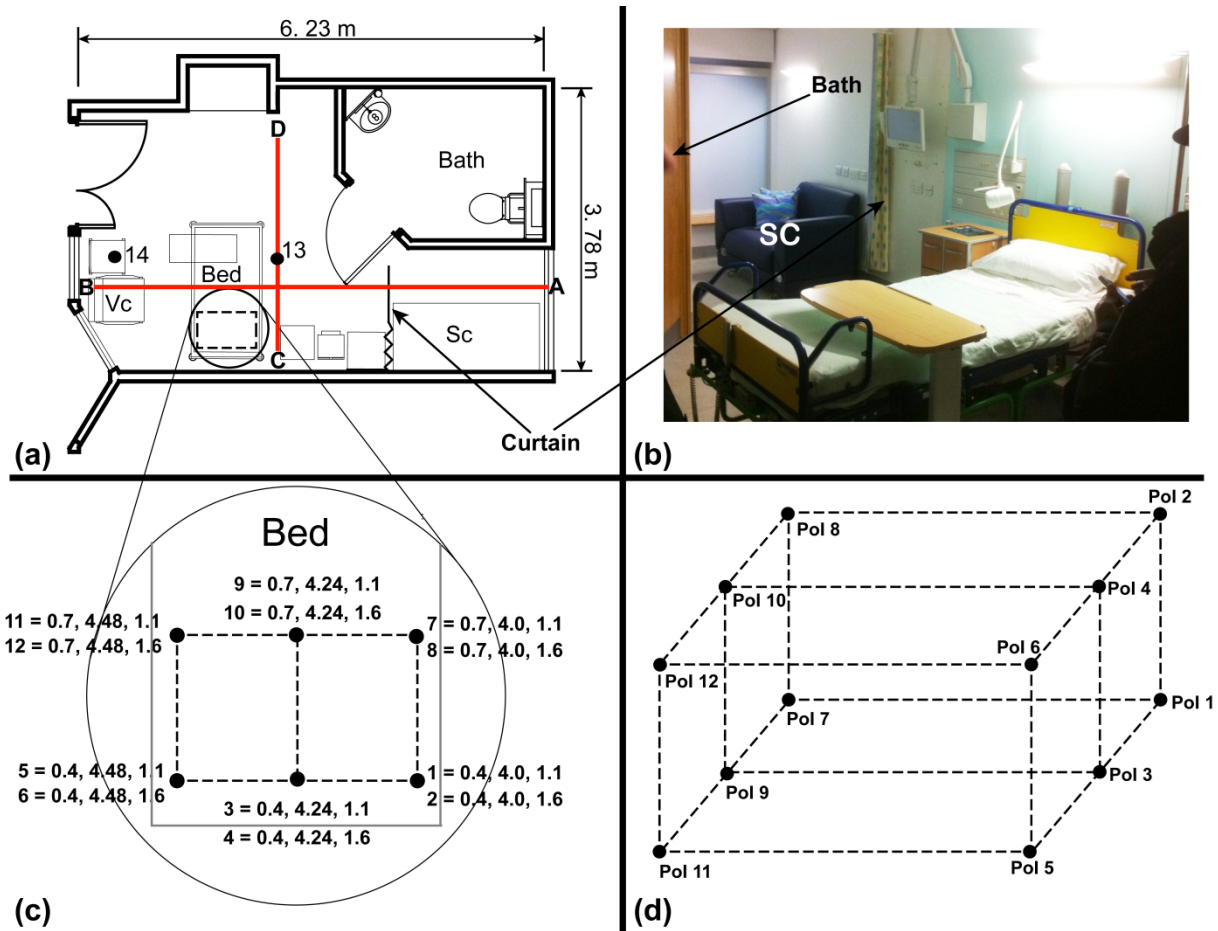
The GOSH ward in (a) floor plan (b) interior of mock-up (c) details of POIs in plan (d) details of POIs in 3D
